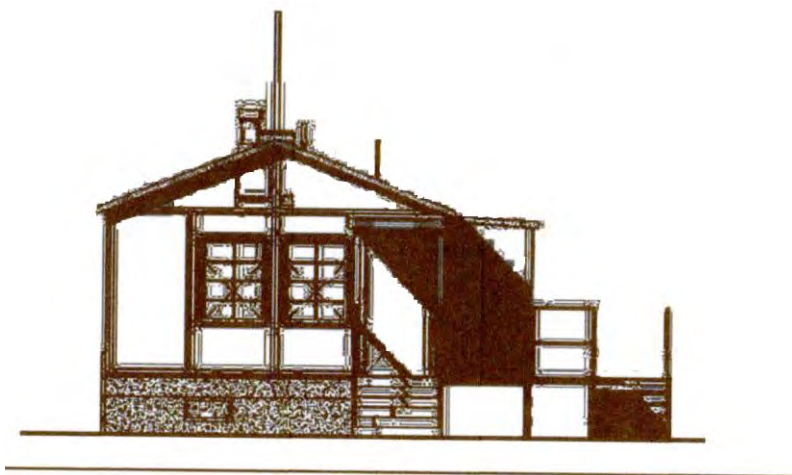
Grants-Milan Flight Service Station, East Elevation.
